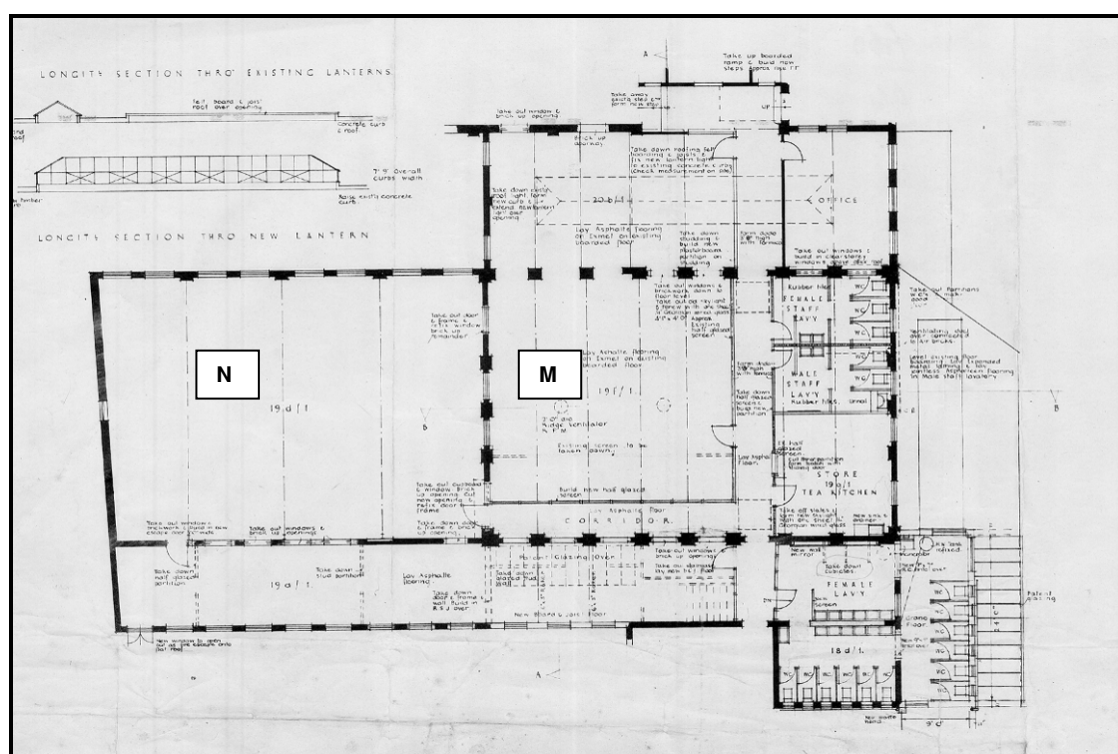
Architect's drawings of proposed alterations and additions to the Works in 1950 (WPM)
